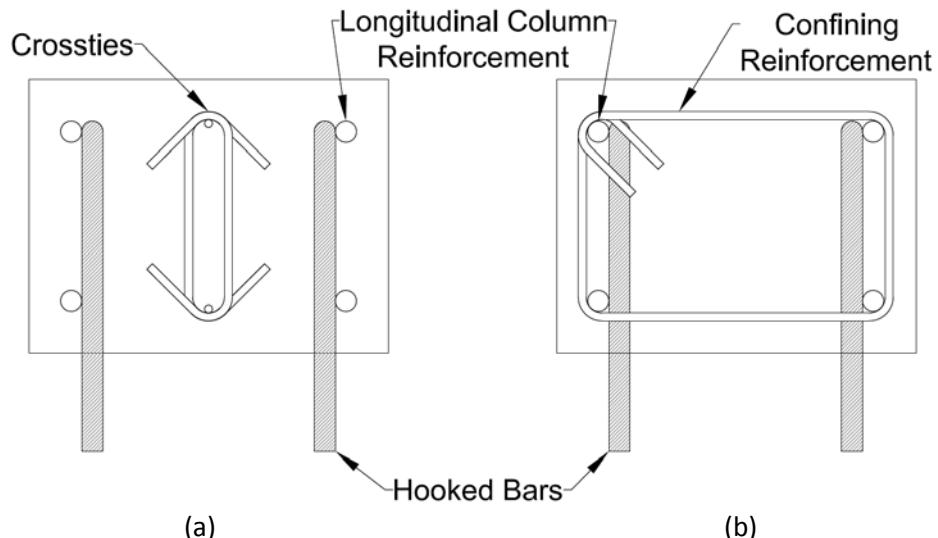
Cross-section of specimens (a) with crossties and no confining reinforcement and (b) without crossties and with confining reinforcement
